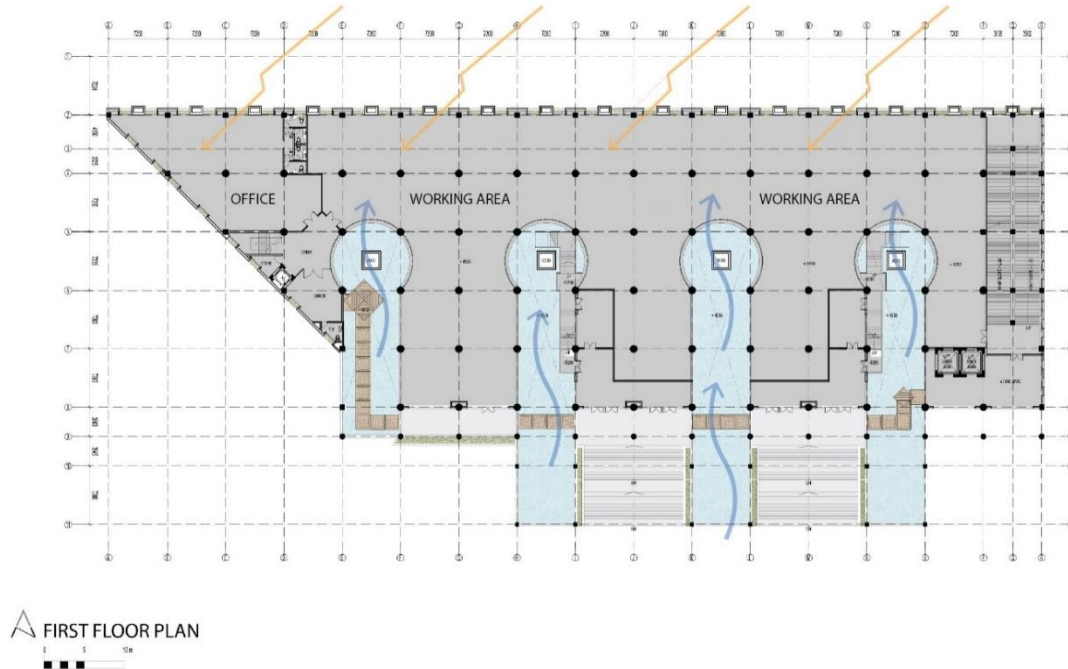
First floor plan of Greenfield Unit of Karupannya Rangpur Ltd. (Source: Author)
